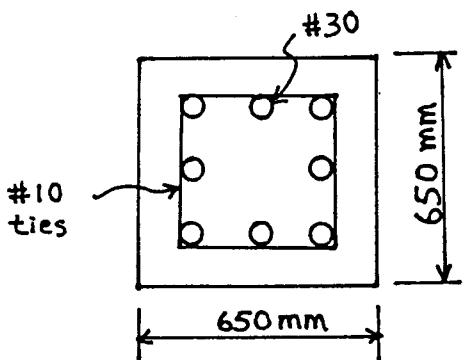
Column section for example 1 specifying #30 bars
